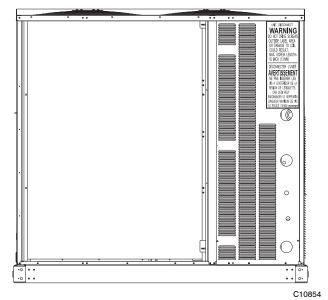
Mounting Position for Field Disconnects (up to 100A)
